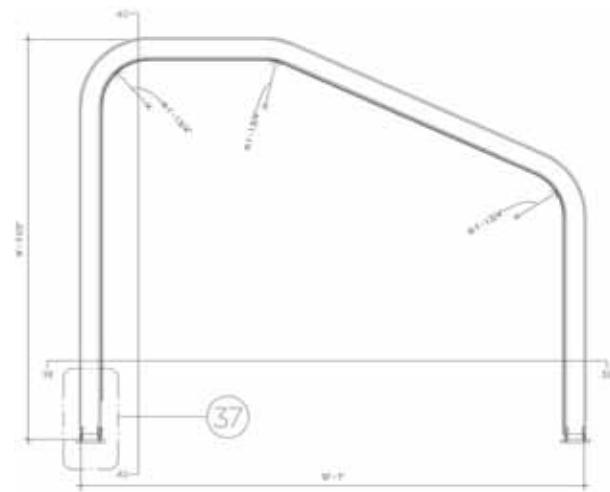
Elevation - Custom Moveable Archway System on Recessed Floor Track
